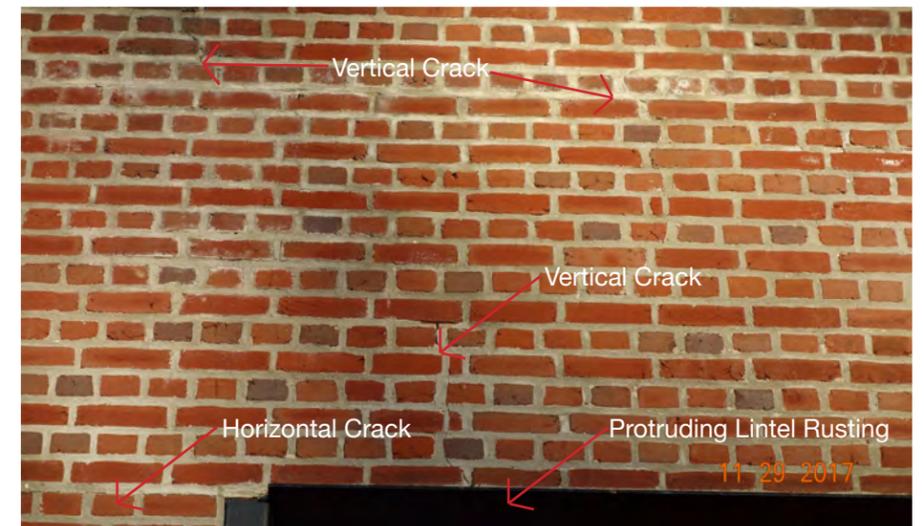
9 Front (West) Facade - Horizontal & Vertical Cracks, Lintel Rusting
